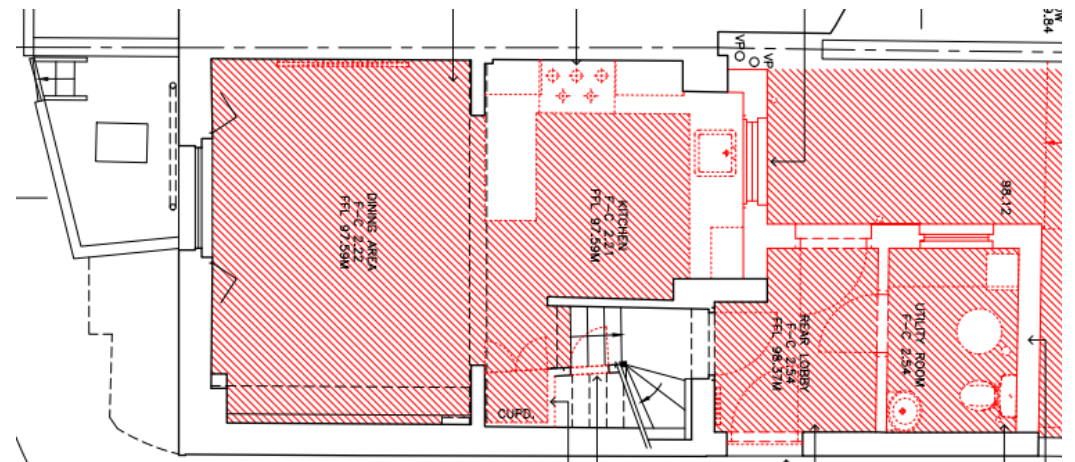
No. 7's lower ground floor layout showing open connection between front and rear room (ref: 23/AP/3226)
